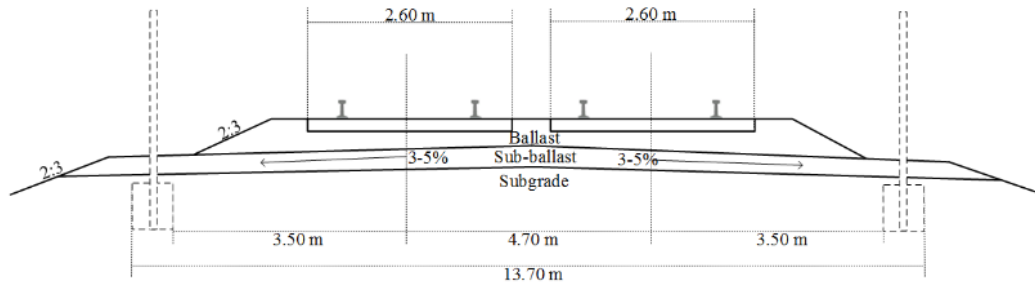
Typical railway section for standard gauge of double track (after Profillidis 2014)
